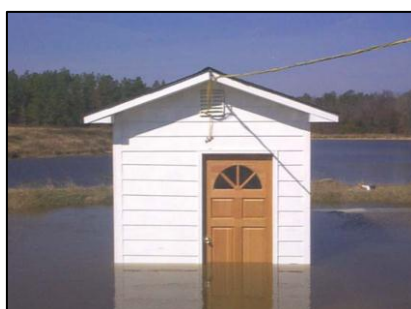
Controlled outdoor testing conditions⁶⁷
